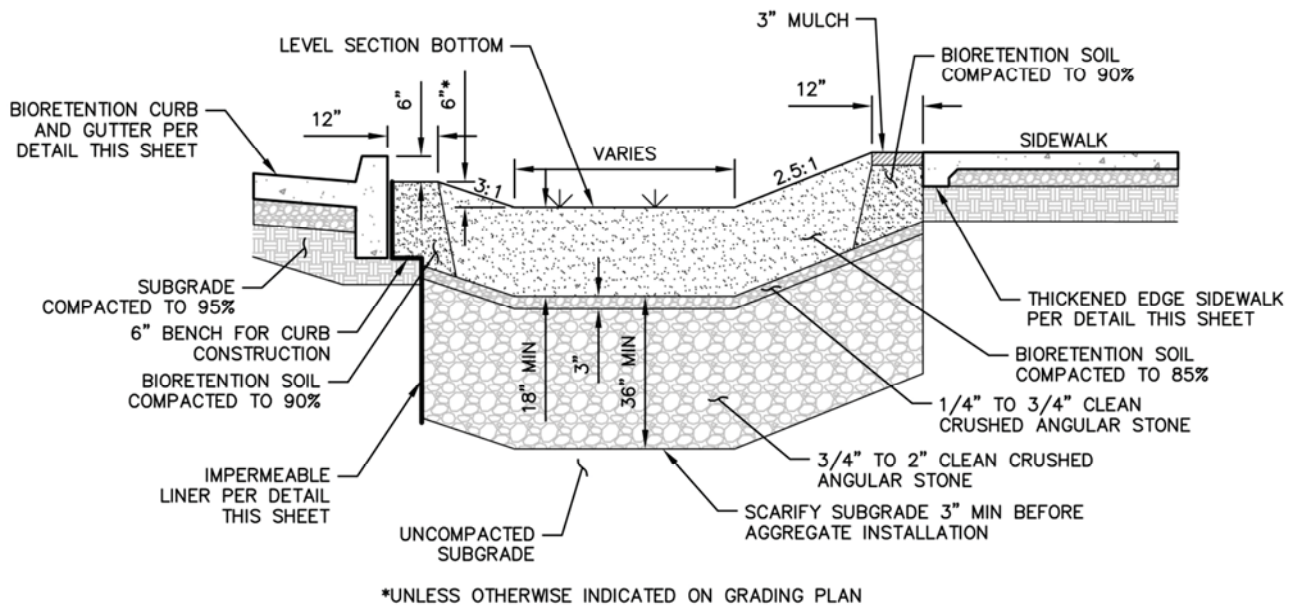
Cross-Section Example of Bioretention Design on 21st Street.
